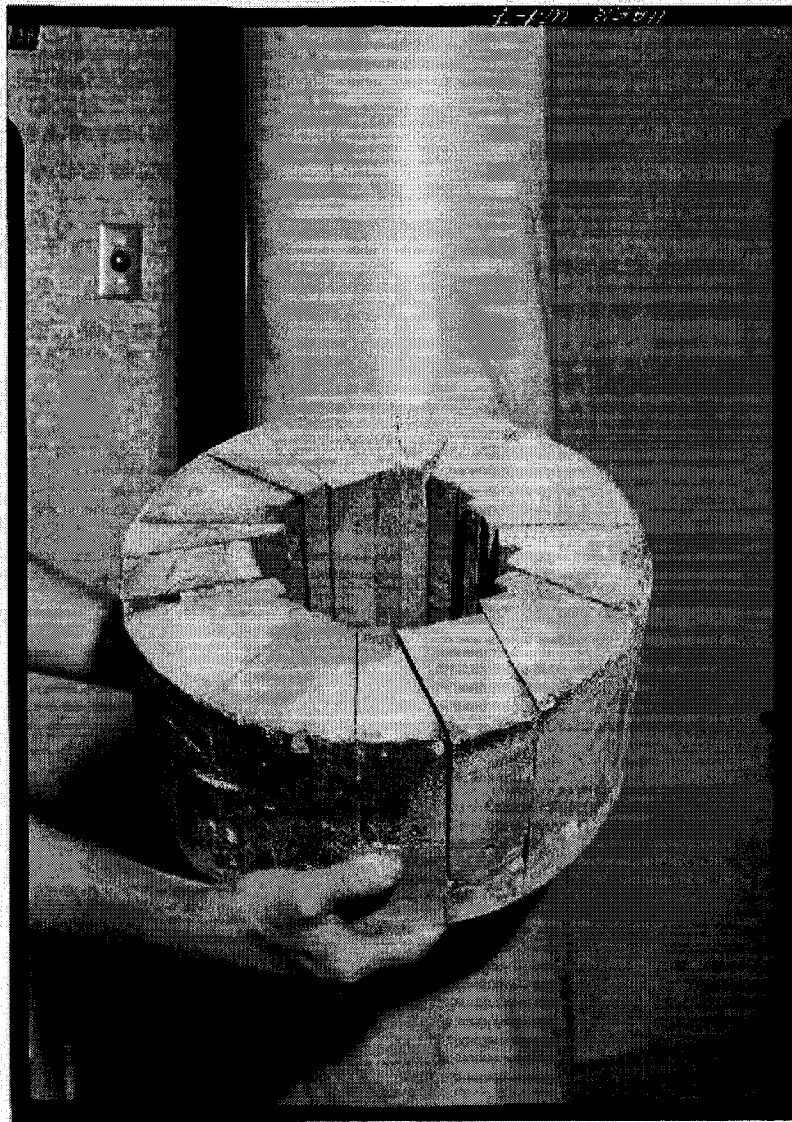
Cross section of pillar with painted pillar behind, Salt Lake Tabernacle
